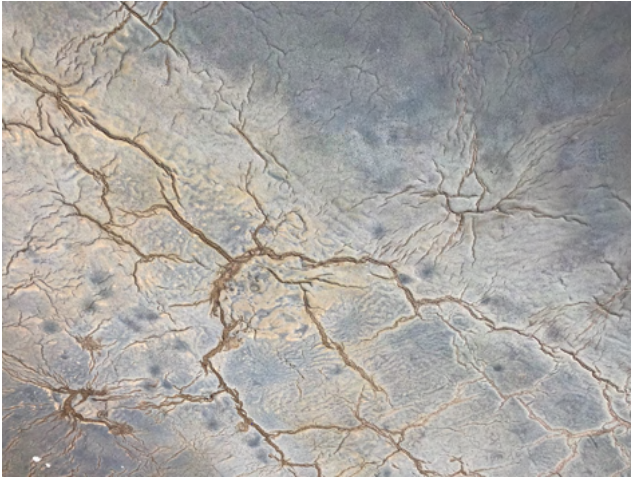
Severely cracked asphalt on 4th floor walkway
